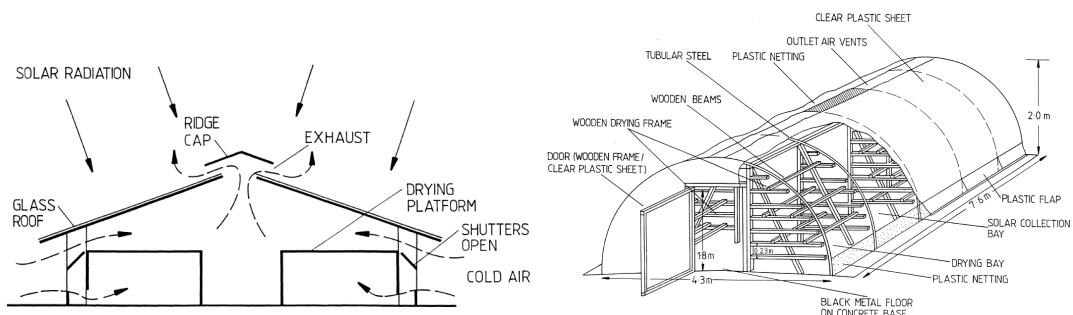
Roof and Dome green house Solar dryer(Prakash and Kumar, 2014)
